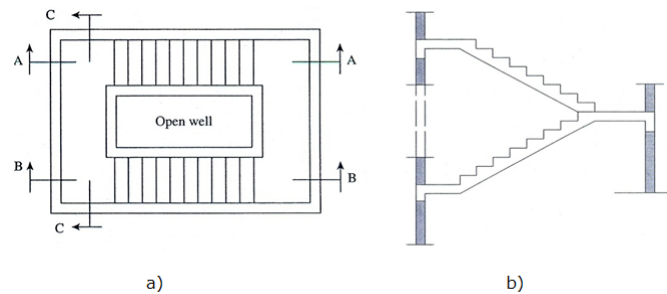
(a) Open Well Stair (b) Section at B-B
